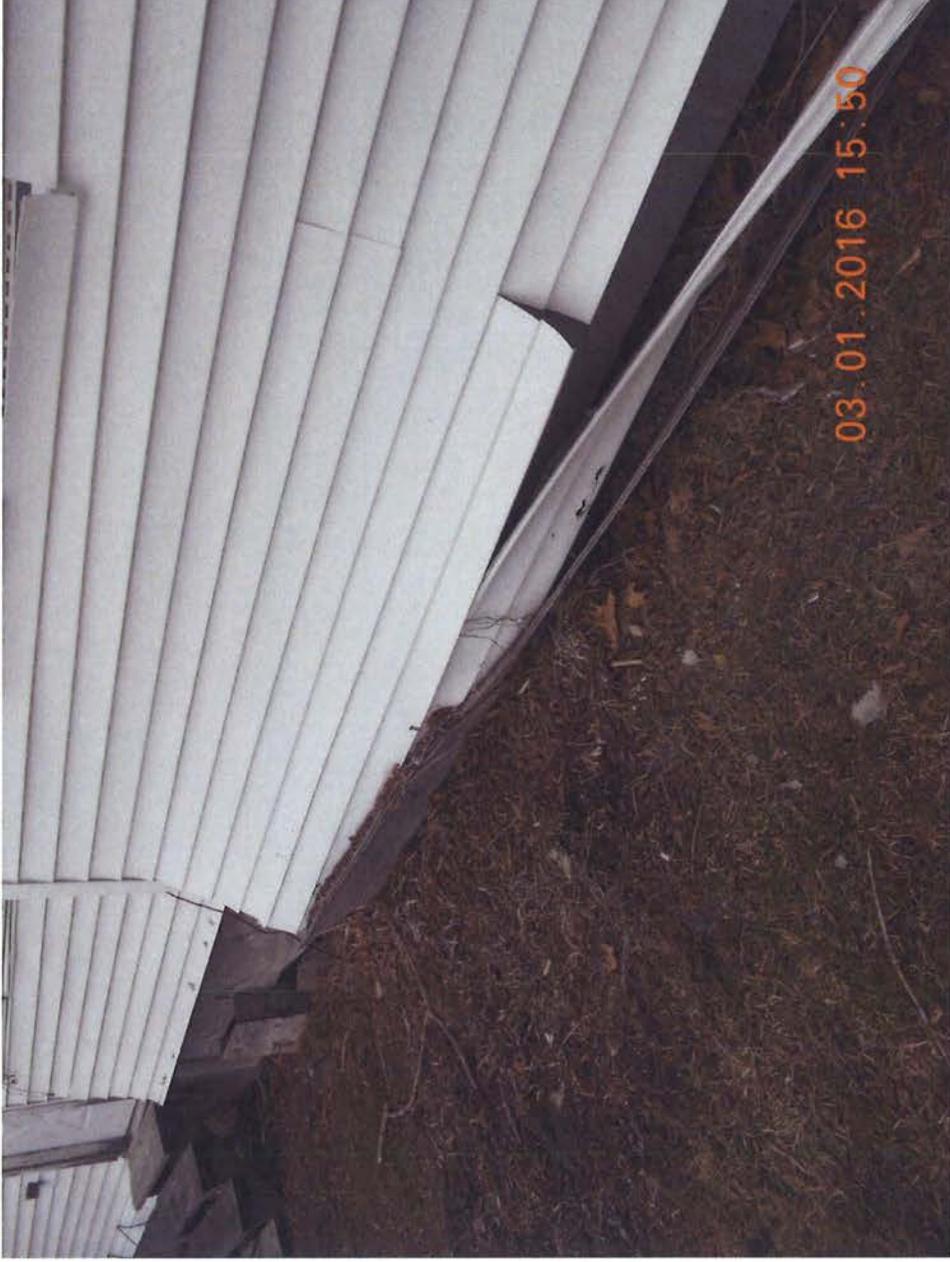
shows severely deteriorated and collapsing skirting leaving unrated materials exposed.
